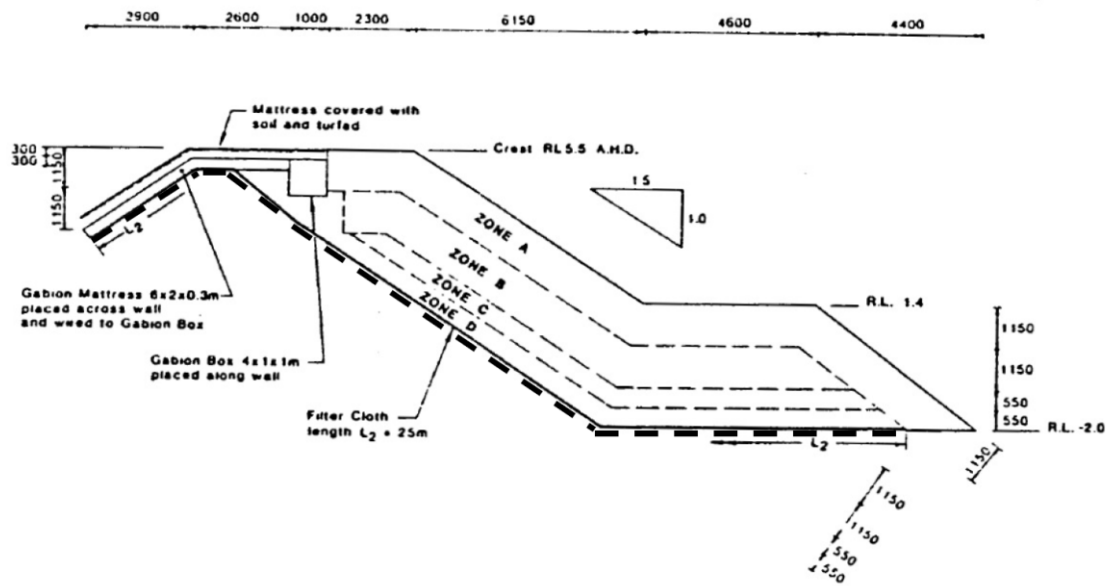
Stockton Seawall Design (source NSW Public Works Department)
